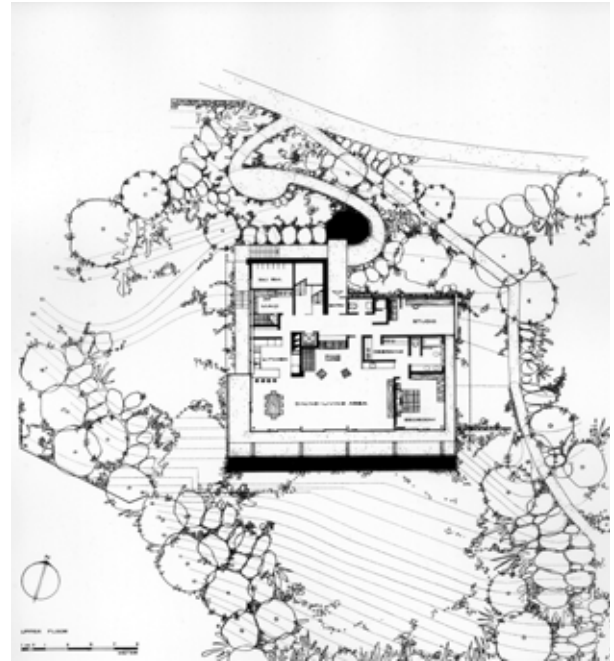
Richard Neutra, Rentsch House, site plan with floor plan for upper floor. Source UCLA Library, Collection Richard and Dion Neutra Papers 1925-1970.
